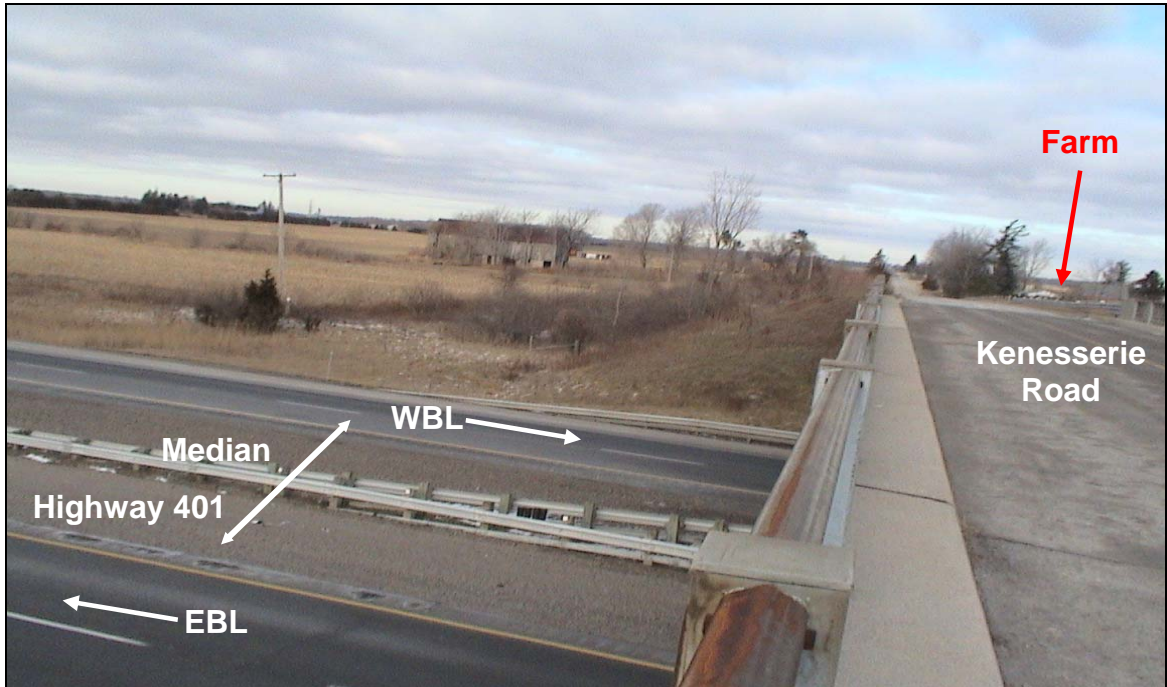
to 5-6	–	Kenesserie Road Underpass
